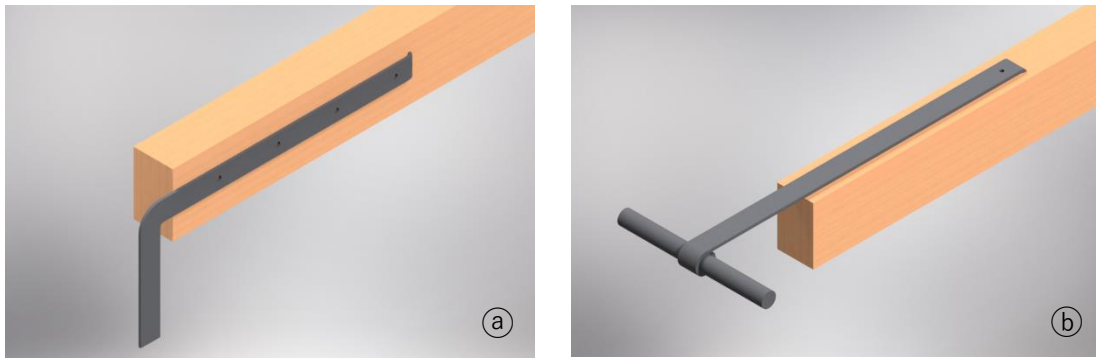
Pavement beams types of anchorages to the masonry exterior walls – schematic representation – (a) ferrolho de esquadro; (b) ferrolho de chaveta - Adapted from (Augusto Leitão, 1896)
